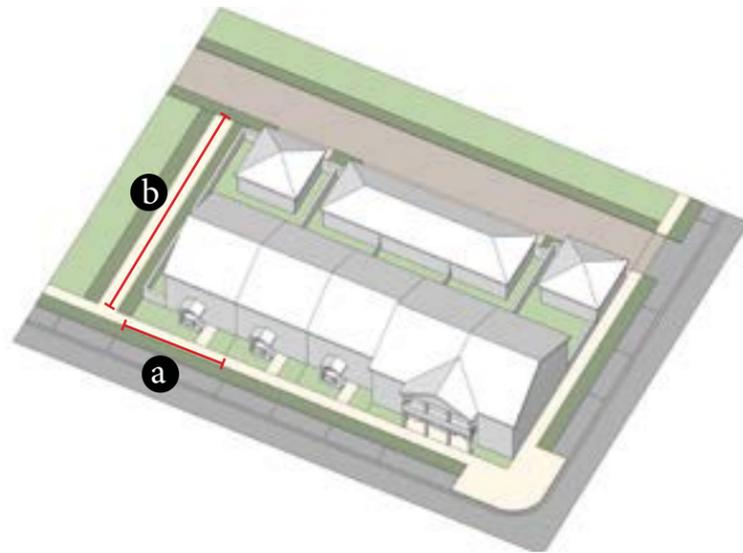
TOWNHOUSE BUILDING TYPE 1
